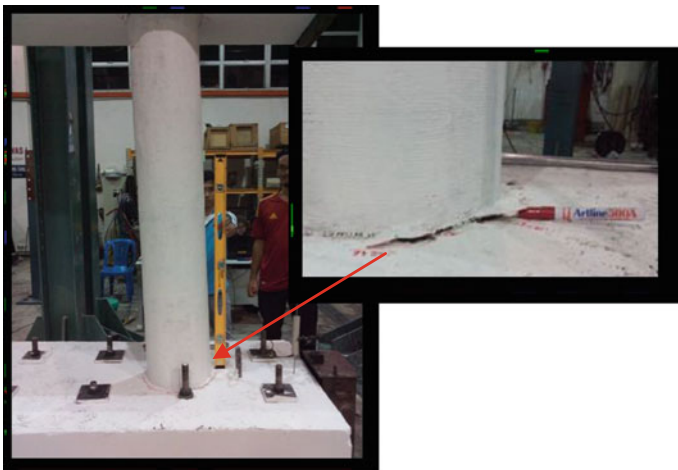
Failure of the joint at pushing direction after $\pm 2.25\%$ drift
